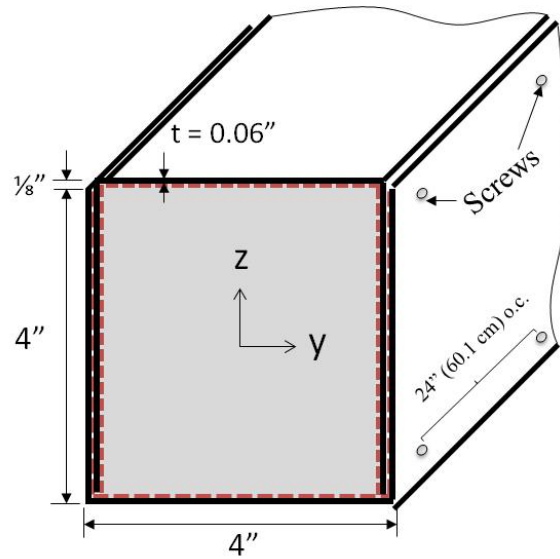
Illustration of “Adhesive and Screws” Column Cross-Section, as Oriented During Test to 20 kips and to Failure
